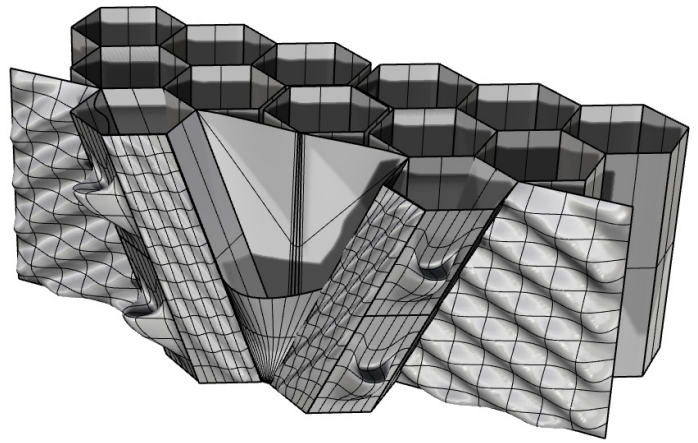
Wall concept that attempted to integrate planters and water channels. Photo by Authors
